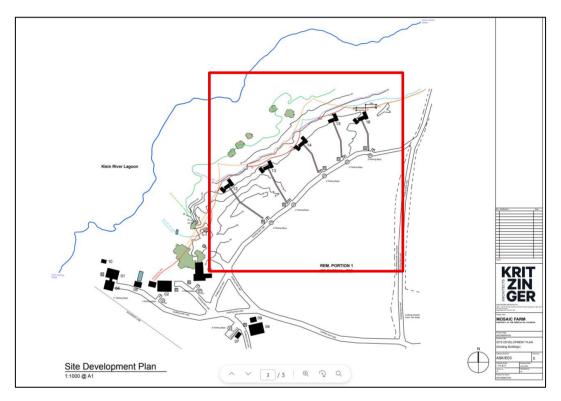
Site development plan indicating 5 boathouses and the starting point of the access road that was constructed in the property.
